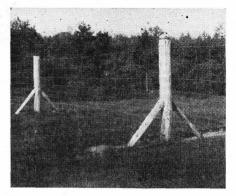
In shallow soil above rock, posts may be set on sills and braced.
